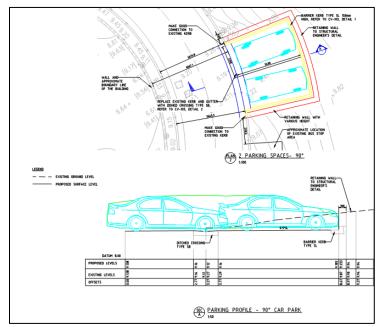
Parking Plan 1-2 Spaces (Stellen, 7/04/2021)
